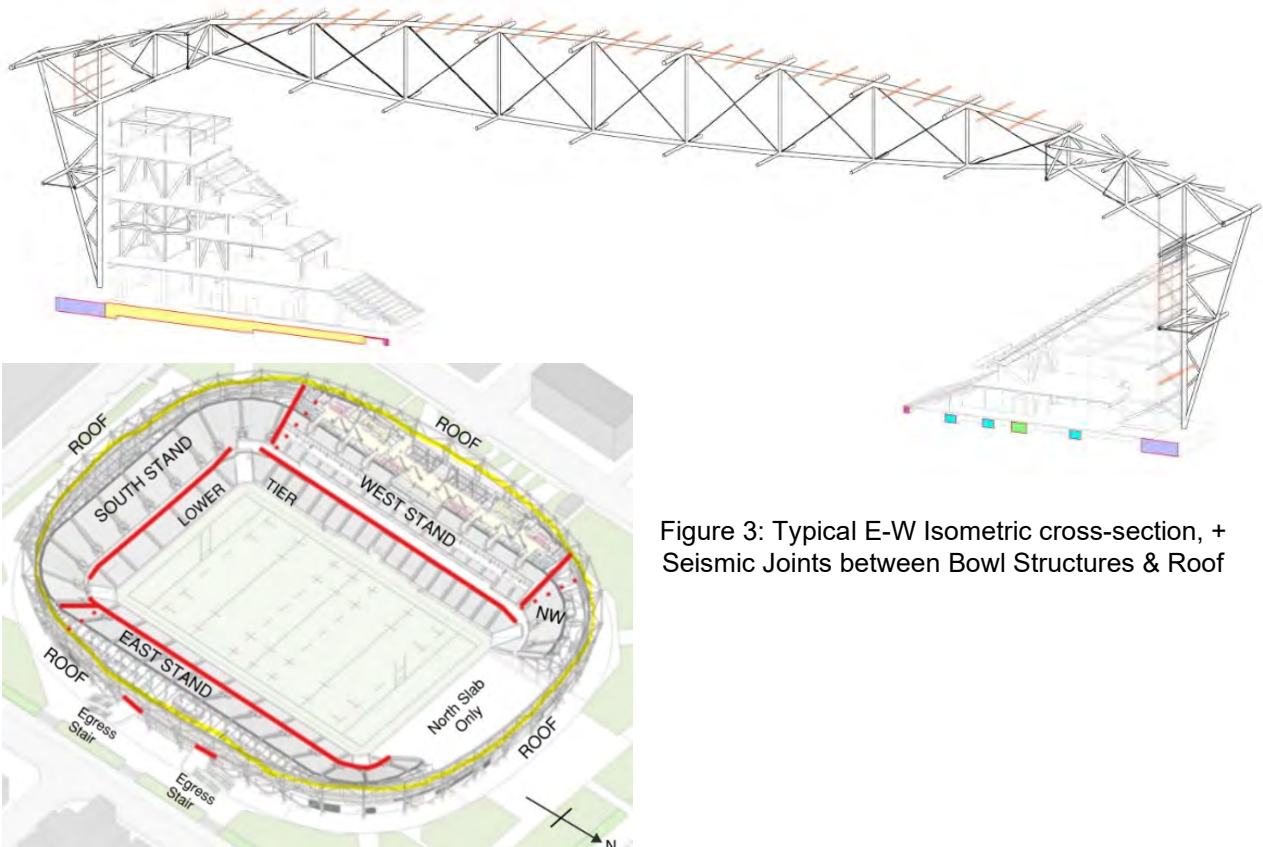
Typical E-W Isometric cross-section, + Seismic Joints between Bowl Structures & Roof
